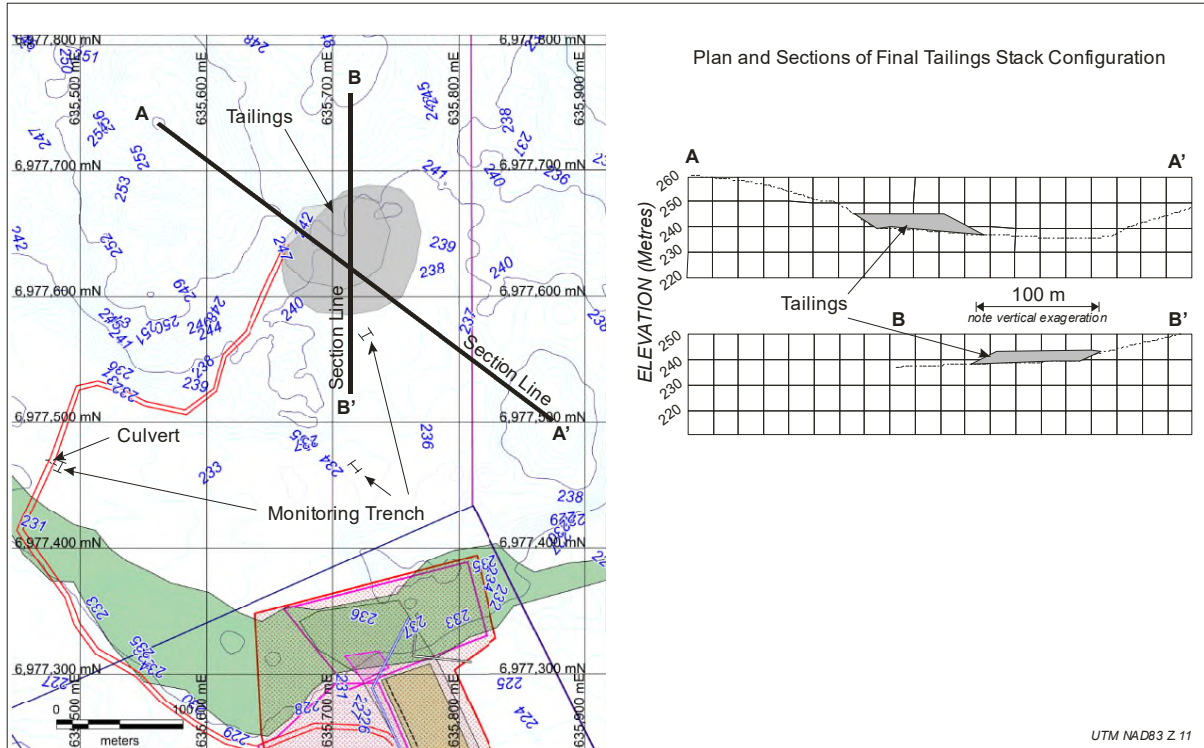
Plan and sections showing final configuration of tailings, monitoring trenches, and infrastructure.
